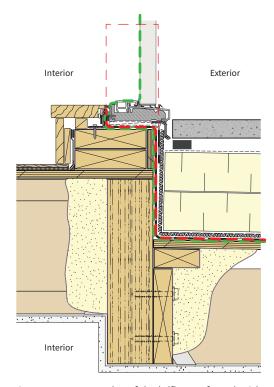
Inverted roof deck (flat roof FR-2) with offset framing, roof membrane from the deck up into the door sill (red dash), and exterior air barrier (green dash).
